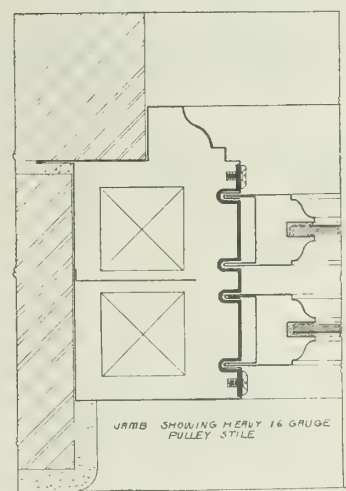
DETAIL OF POMEROY NO. 16 HEAVY GAGE DOUBLE HUNG HOLLOW METAL WINDOW FOR STREET FRONTS
